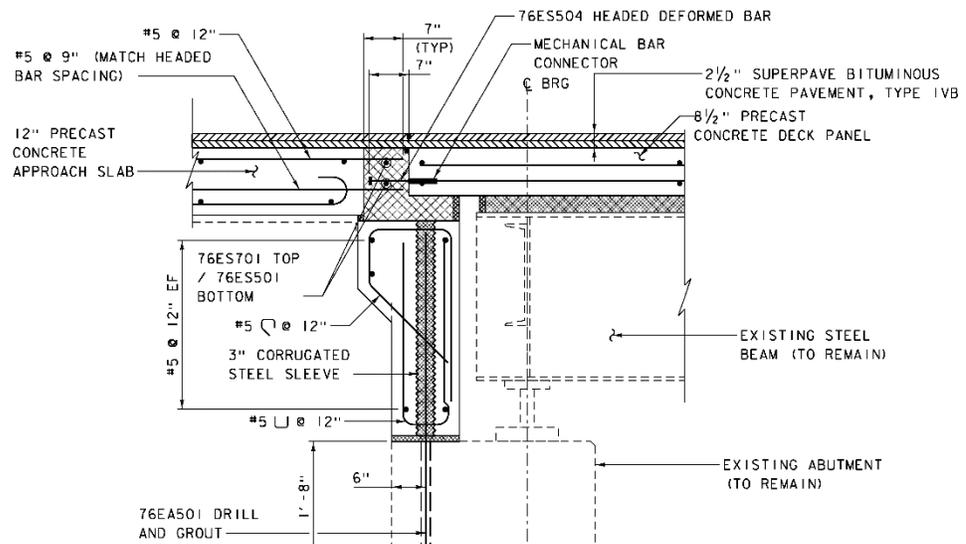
Exp. End Precast Conc. Backwall & Approach Slab
